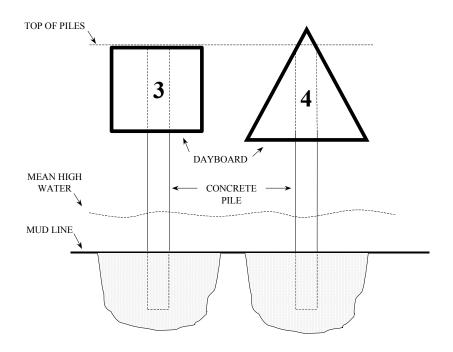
Single Pile Concrete Structure (Unlighted)
